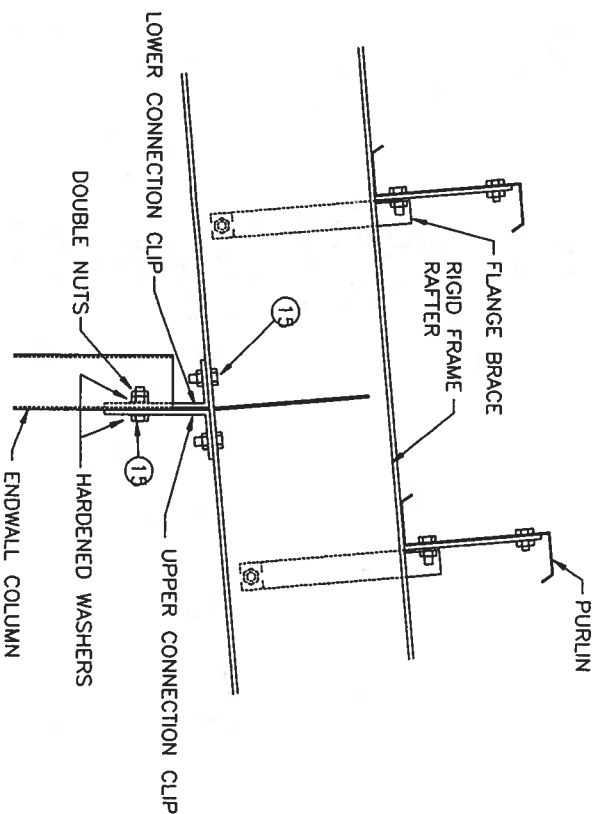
DETAIL: ENDWALL COLUMN TO ENDWALL RAFTER
